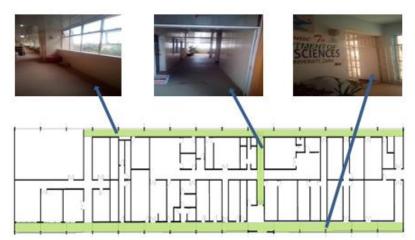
Plate XXIX: Floor Plan of Nursing Department, Showing Compartmentalization of Spaces. Source: Author fieldwork, 2016
